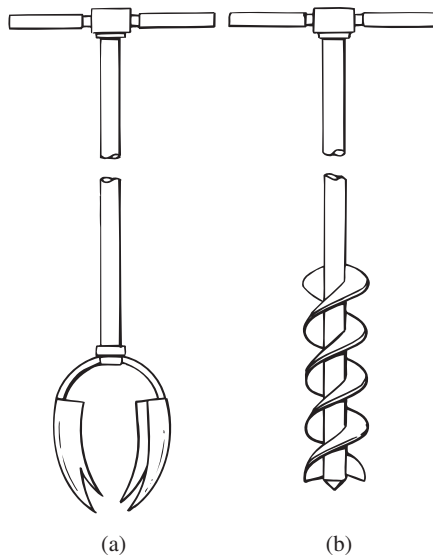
Hand tools: (a) posthole auger; (b) helical auger
